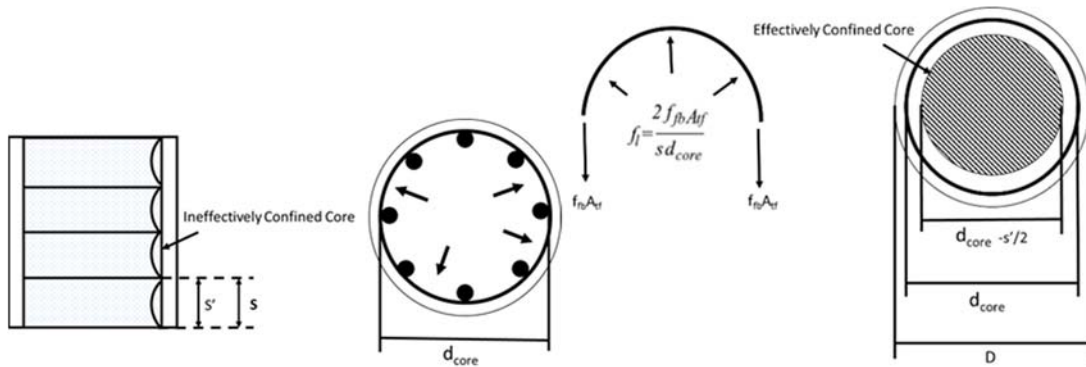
Arching Action for Hooped Circular Reinforced Concrete (RC) Columns, adapted from Afifi et al. (2014)
